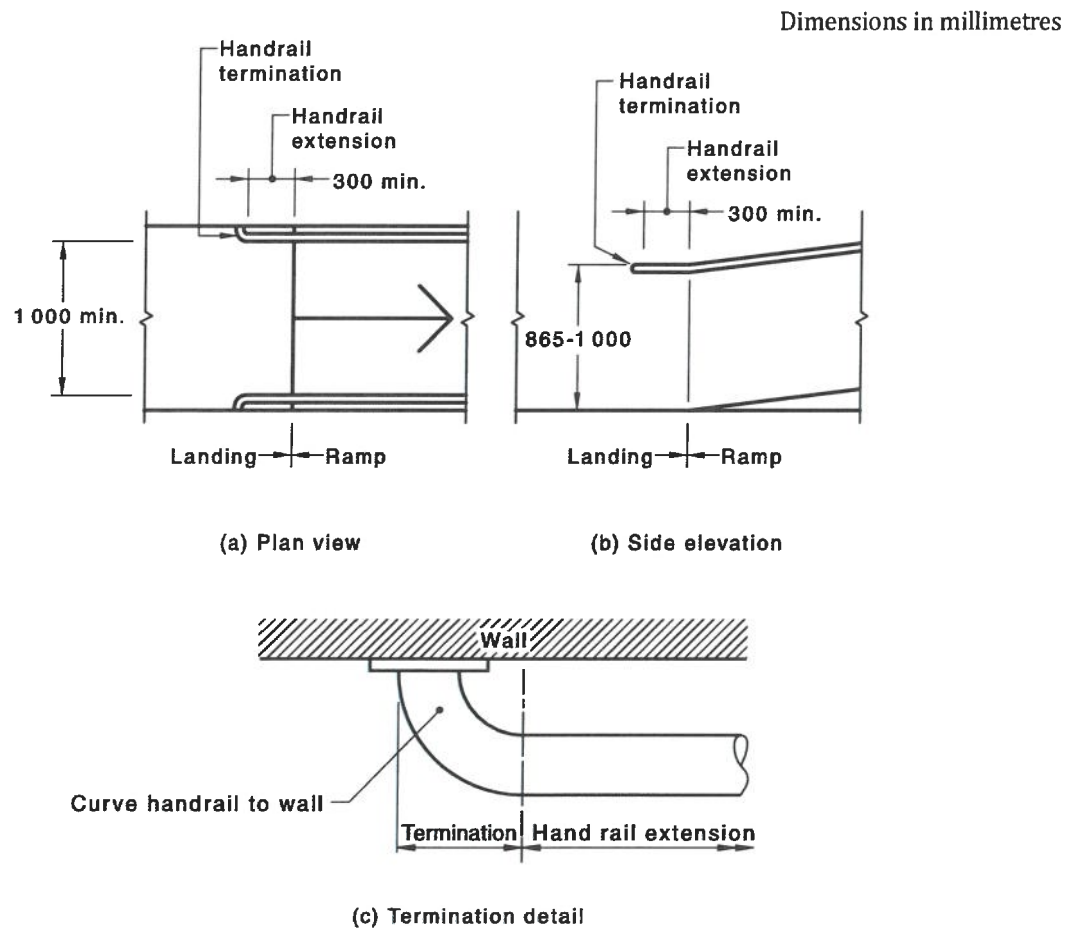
(B) — Ramp handrails — Detail for handrails terminated by turning horizontally through 90° to the wall
